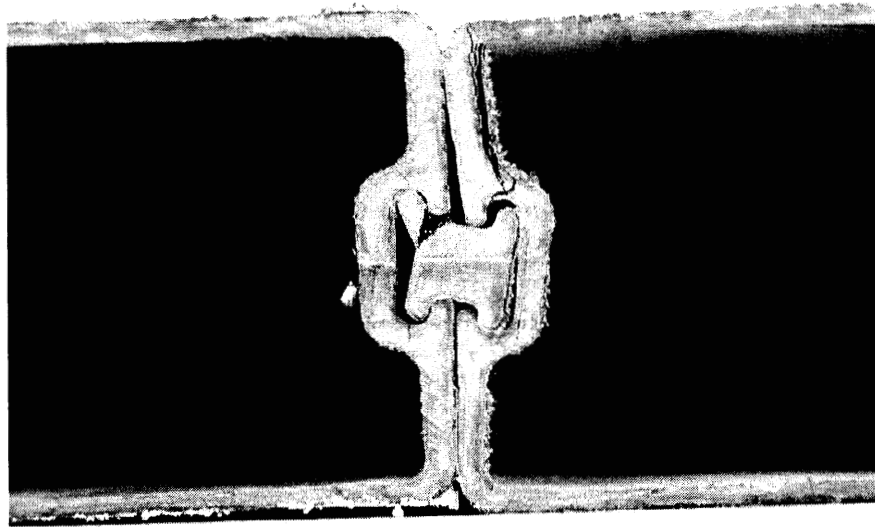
Out-of-Plane Shear Test, Toggle only (OPST3b)
